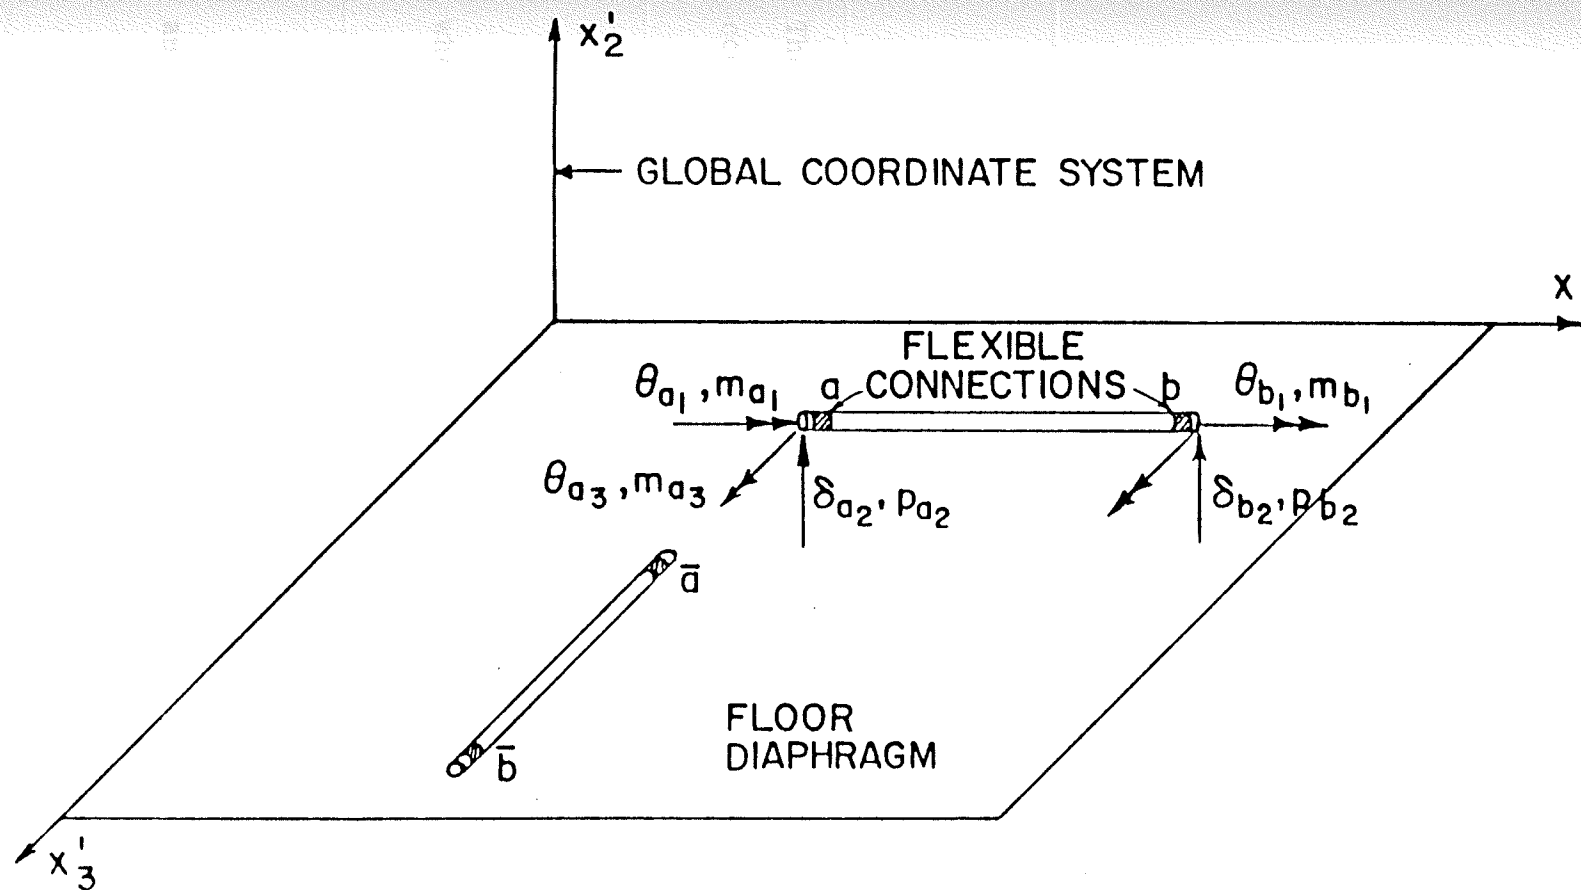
TYPICAL BEAM ab WITH FLEXIBLE CONNECTIONS
